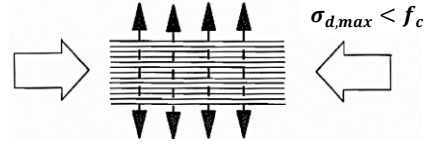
Compressive strength of the concrete strut with longitudinal cracks [17]
